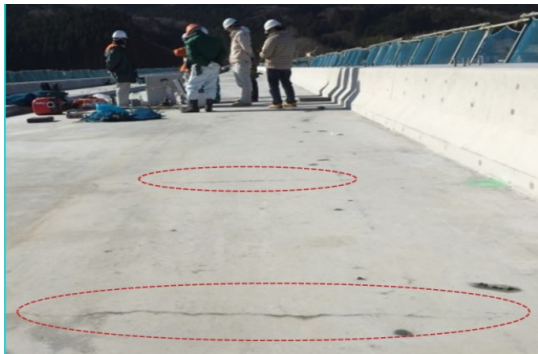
Transverse cracks in Shinkesen Ohashi RC slab
